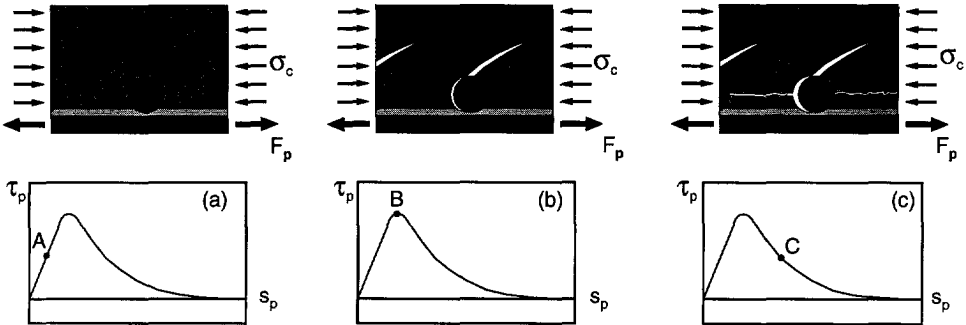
Hankers's damage model of static bond failure (Hankers [1995]⁵)
